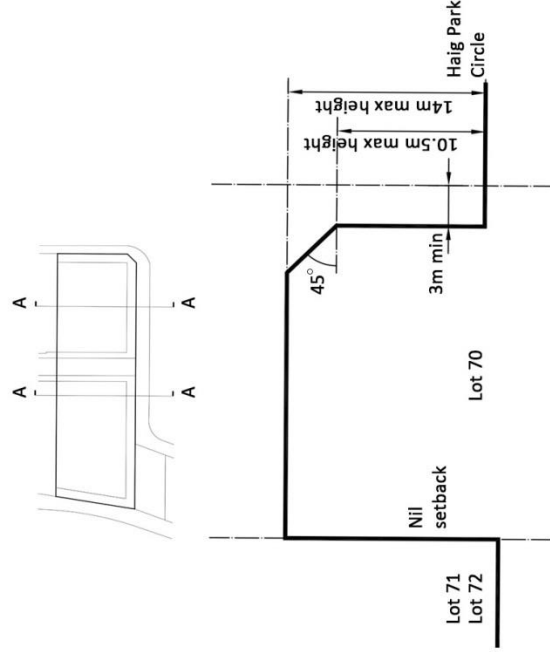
Section AA - North south section of building envelopes through eastern and western buildings.
